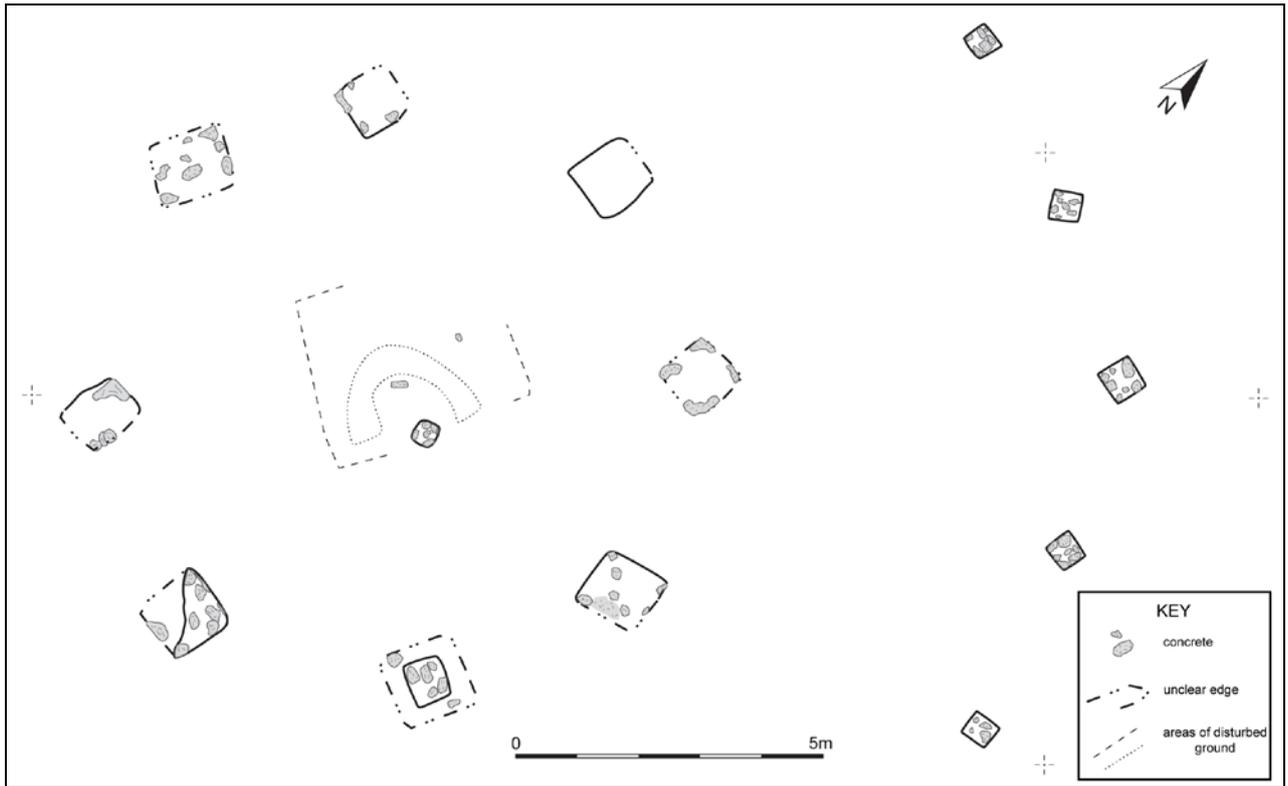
Detailed plan of the exposed remnants of the barrage balloon footings.
